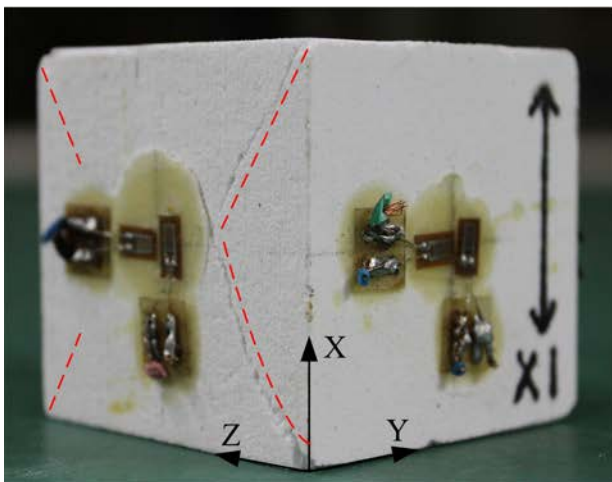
Failure of a typical cubic specimen under compression in the X direction
